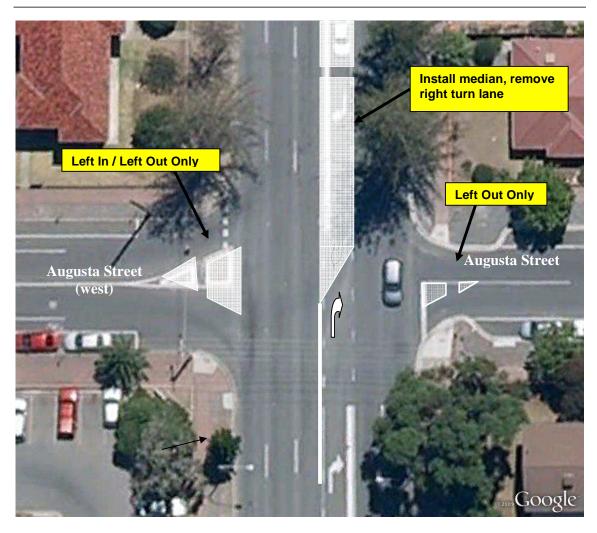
Proposed Brighton Road / Augusta Street Improvements (Option 2)
